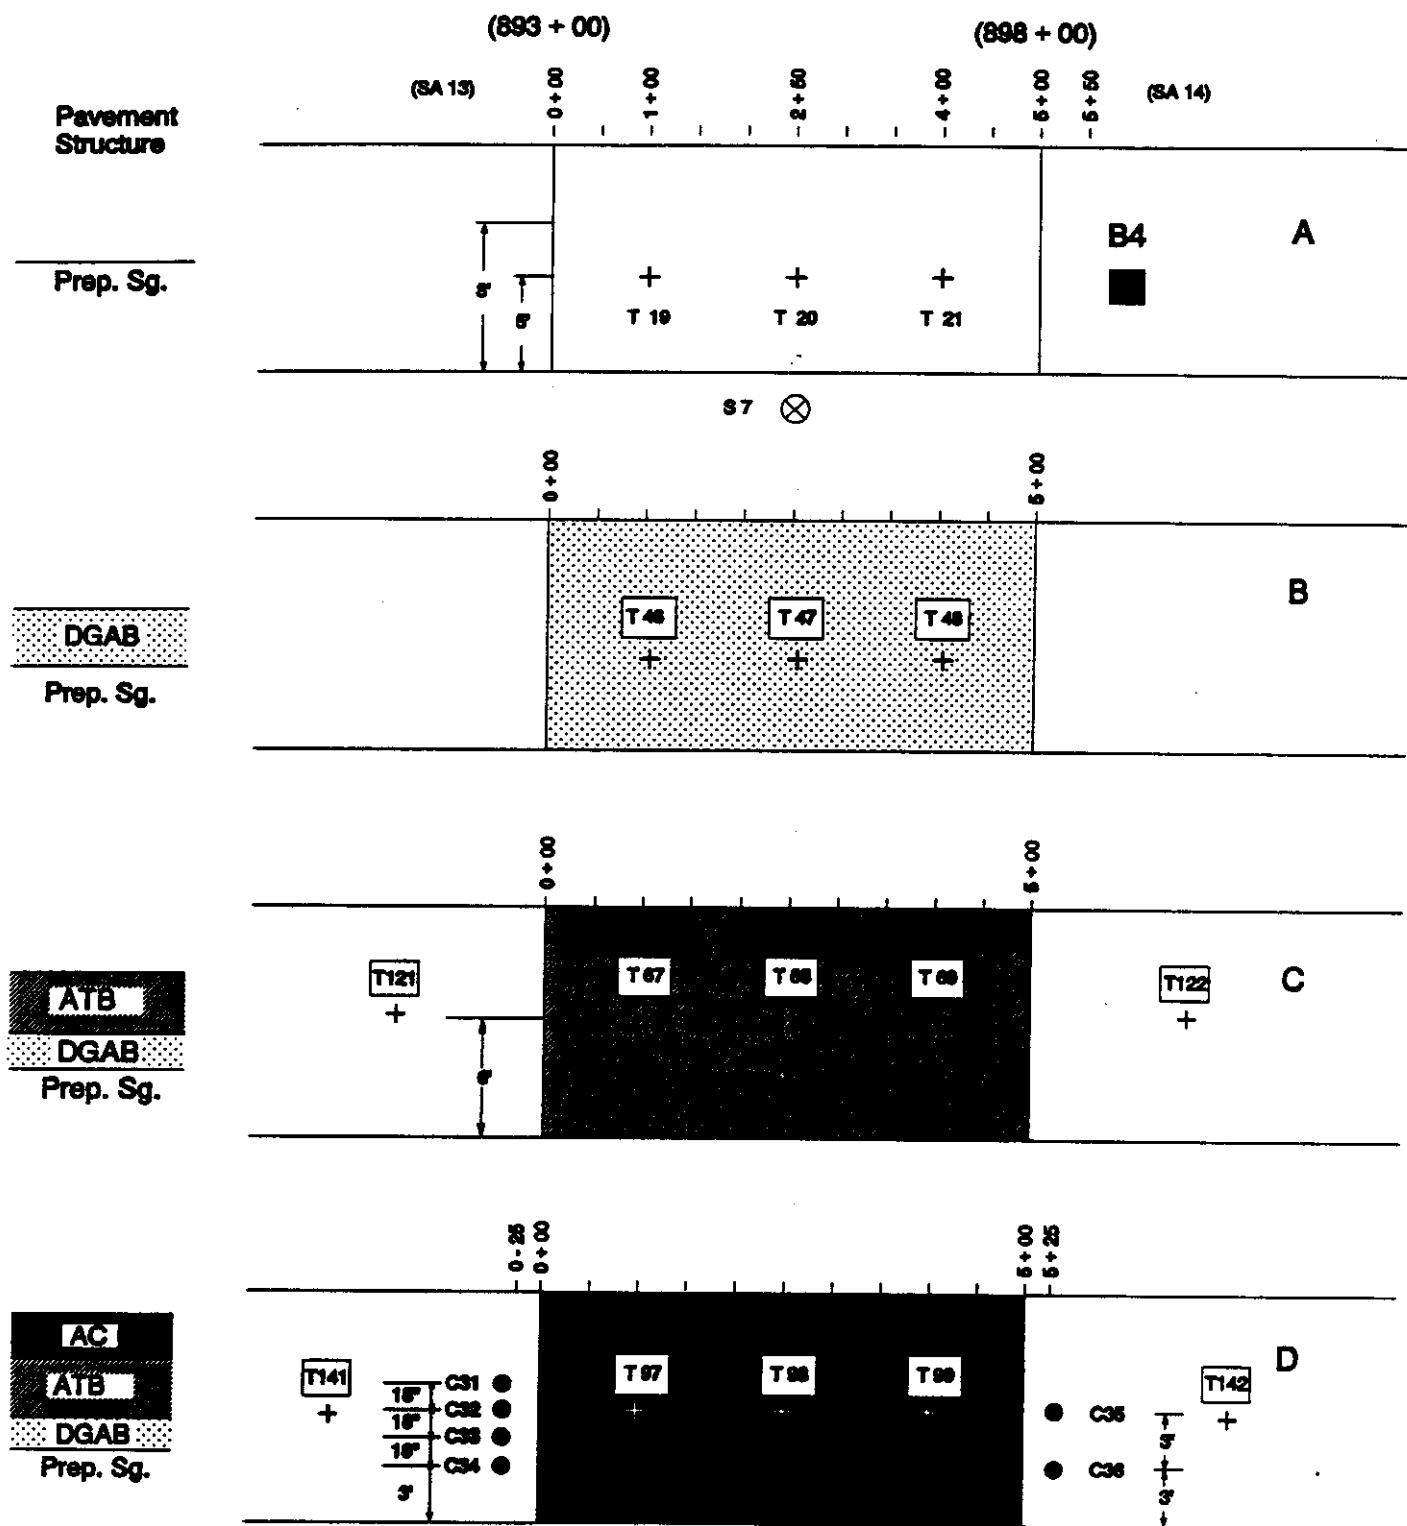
SAMPLING AND TESTING PLAN FOR TEST SECTION 050123
